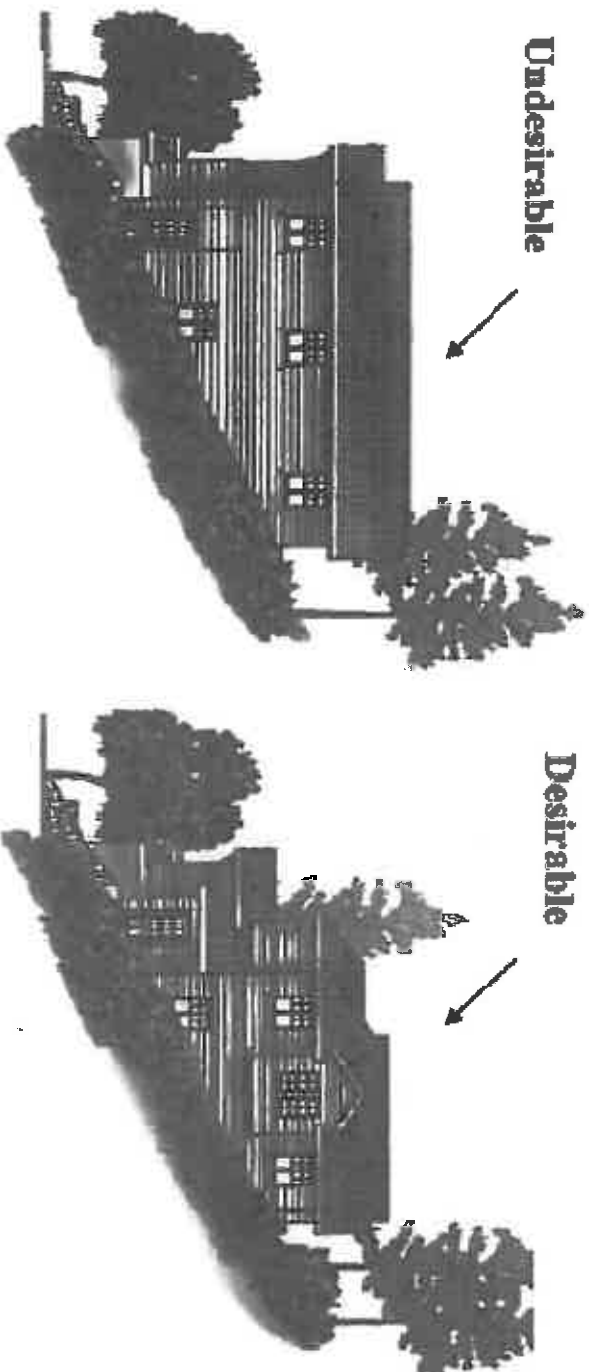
The desirable design mitigates bulk by stepping down with the slope and breaking long continuous roof and building walls into smaller elements.
